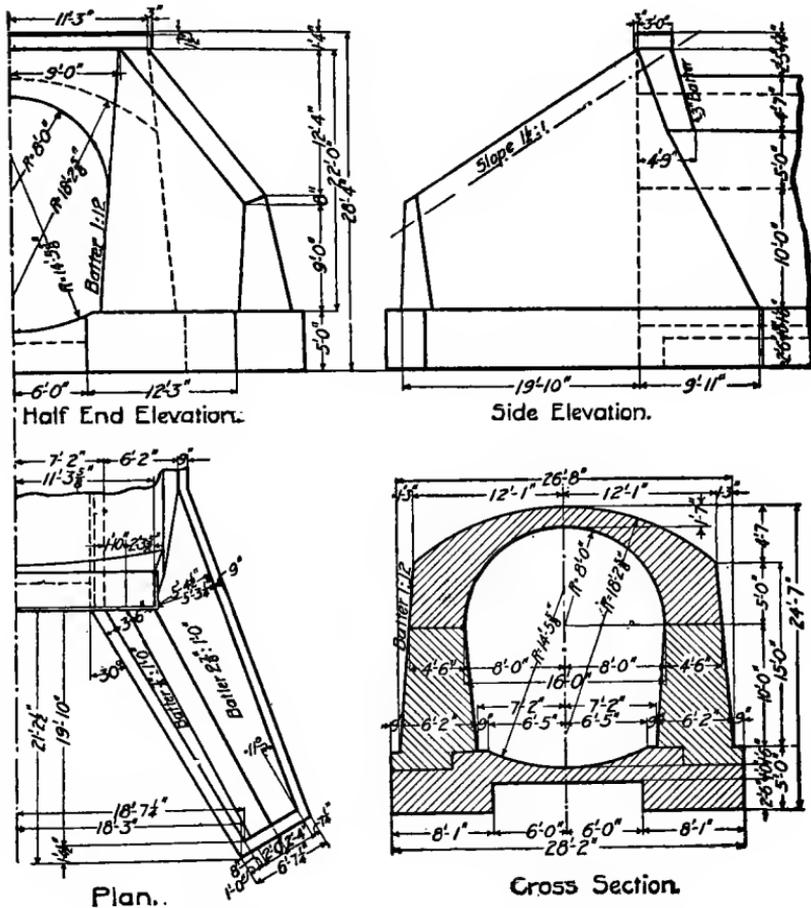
ILLINOIS CENTRAL PLAIN CONCRETE ARCH CULVERT.
